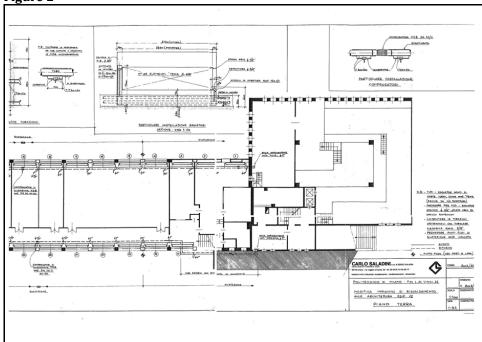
School of Architecture. Heating System. Plan-Details-Section (1:100)
